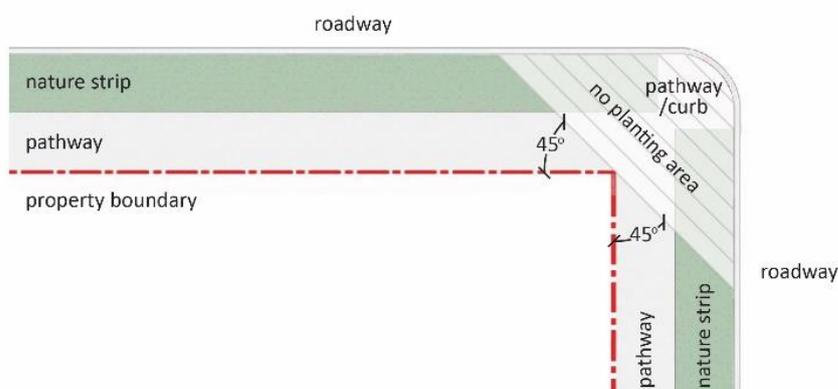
To maintain visibility, street corners are not to be planted for a 45degree splay from the property.
